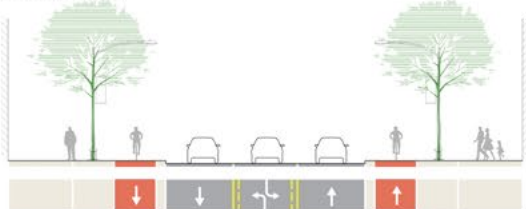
11th Street typical section Colorado Street to Guadalupe street & I35 to San Jacinto Boulevard
